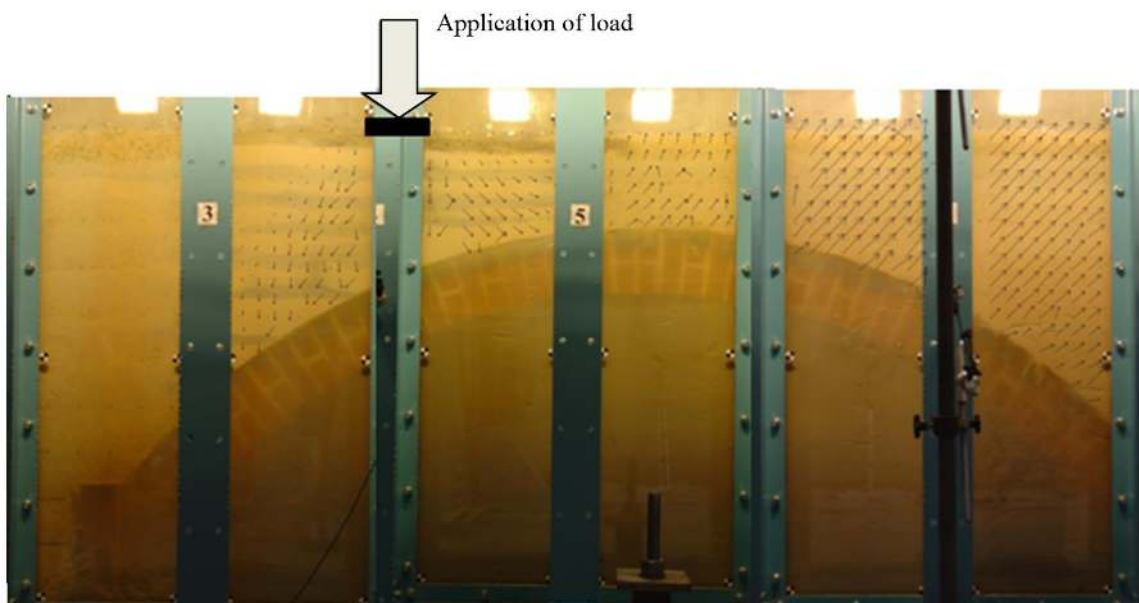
Large-scale laboratory testing on filled masonry arch bridges (Gilbert et al., 2006).
